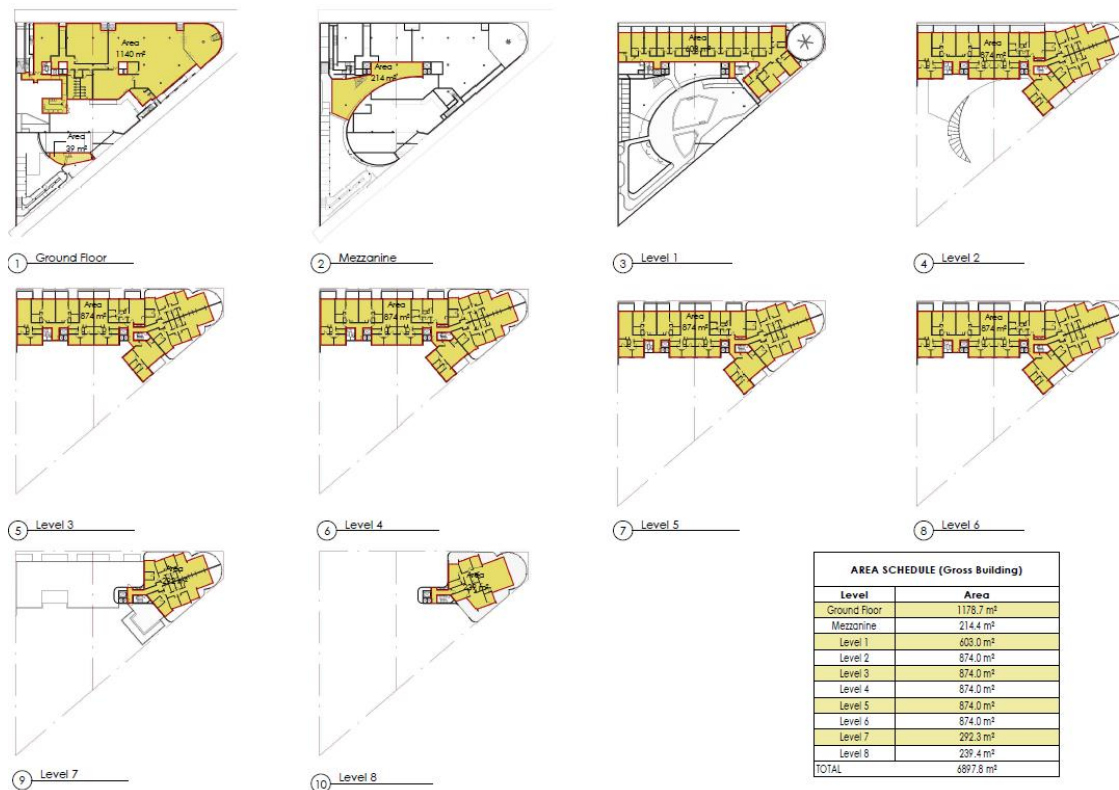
Distribution of floor space towards Brunker Road and Nineways, away from adjoining residential and lower density land use.
